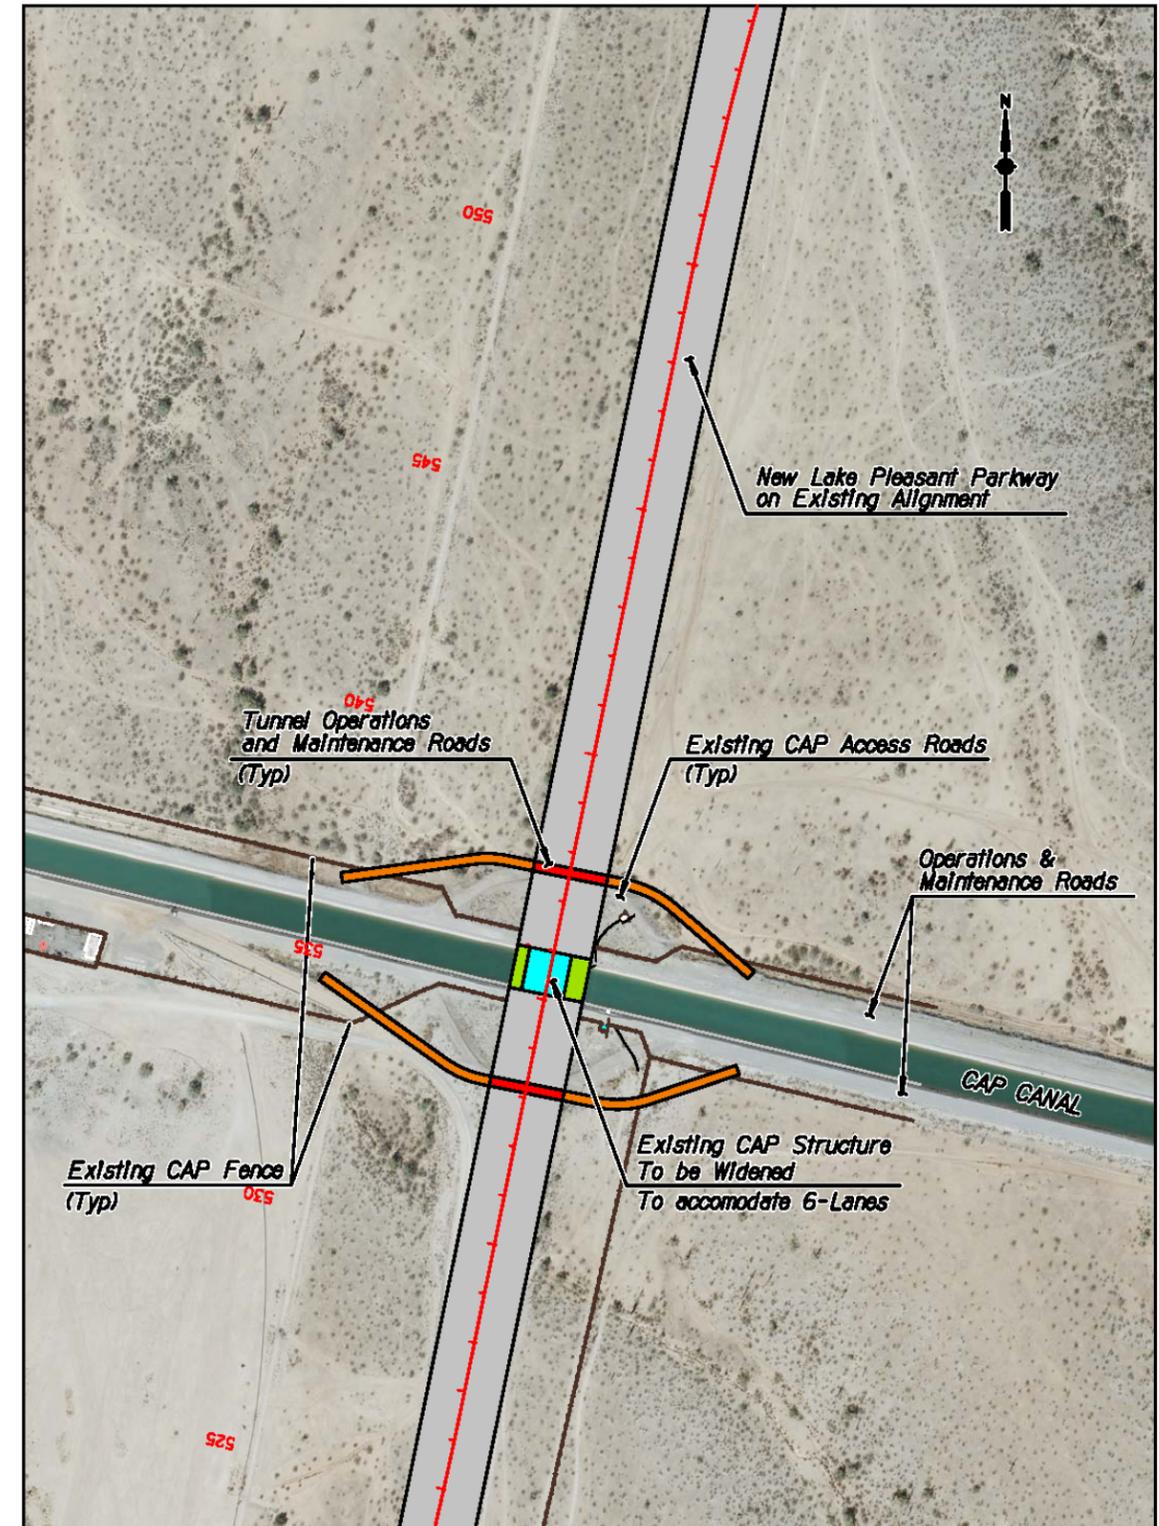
CAP Alternative 5: Access Roads at Grade
